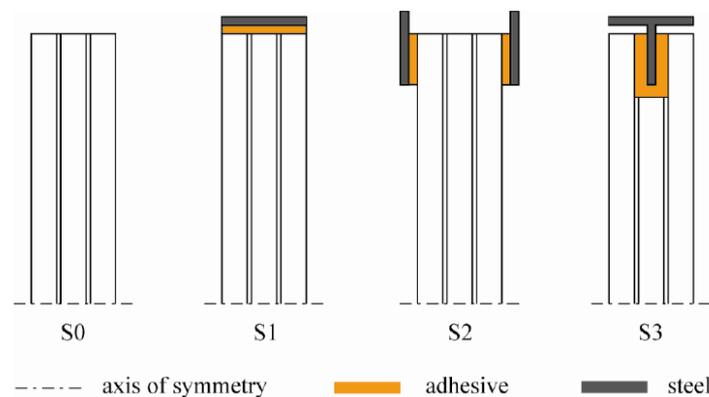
Half cross sections of tested beams, as in [3]. Laminated glass beam without reinforcement tested for comparison.
